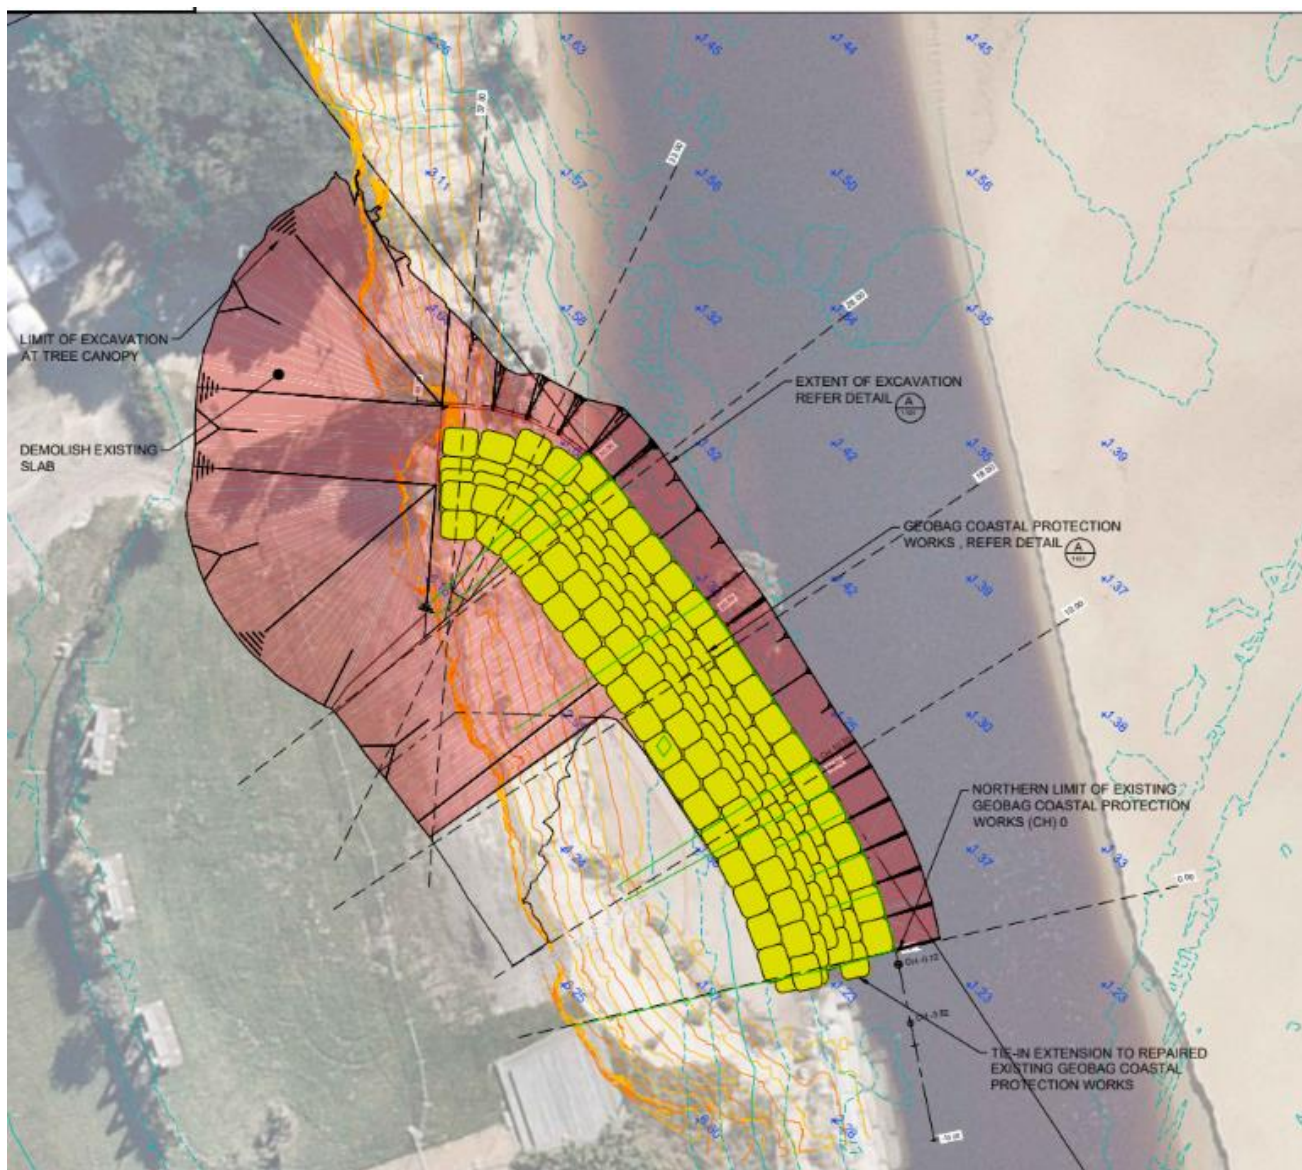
Works Zone constructed from above proposed geobag wall and Staging Area at existing geobag stockpile.
